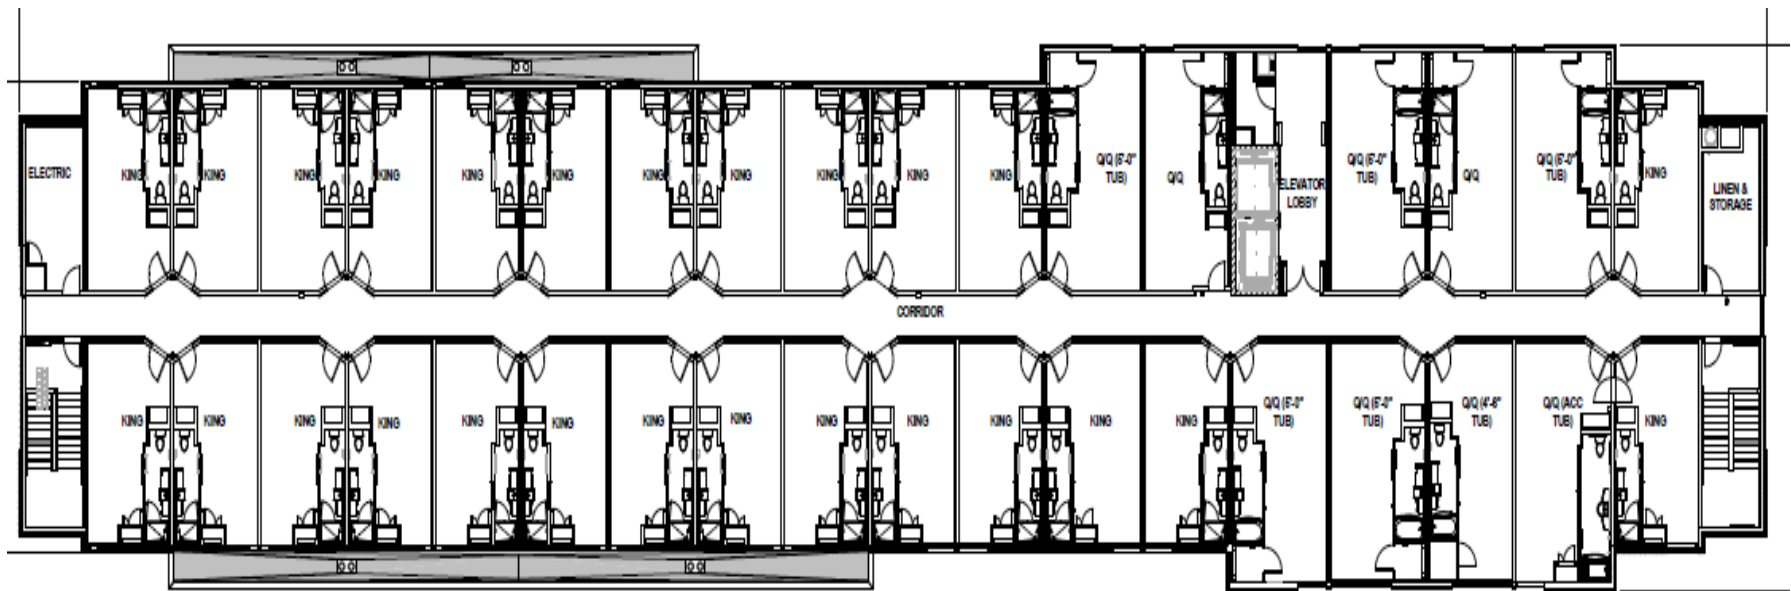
Exhibit D: Floor Plan-2<sup>nd</sup> Floor
